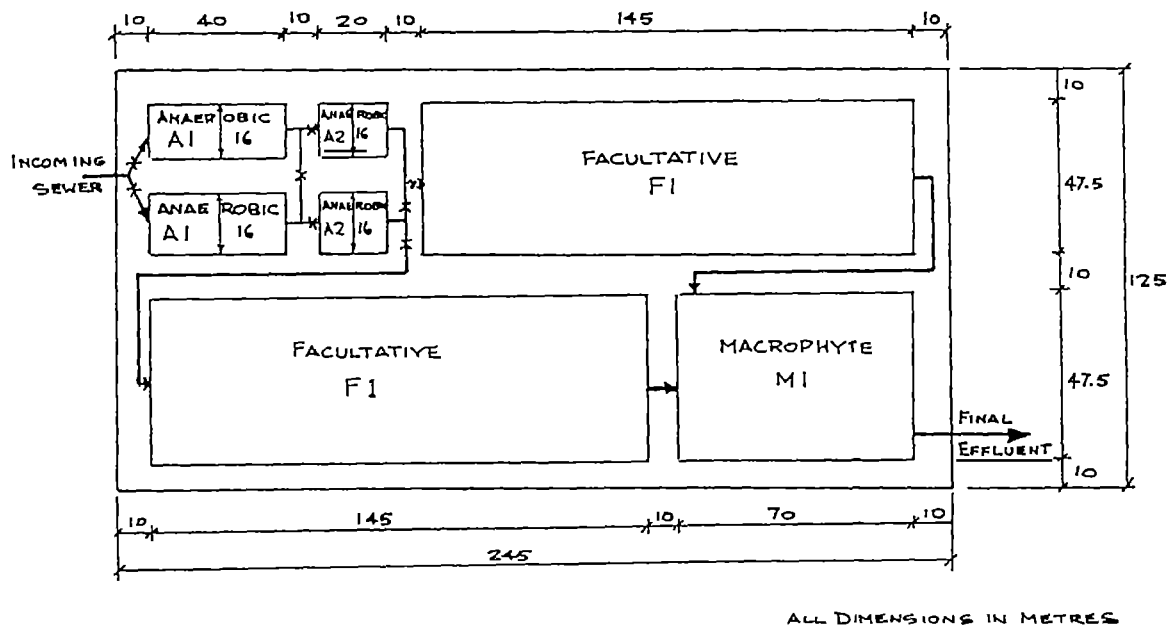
Diagrammatic Pond Layout for El Nazlah Village, Fayoum
